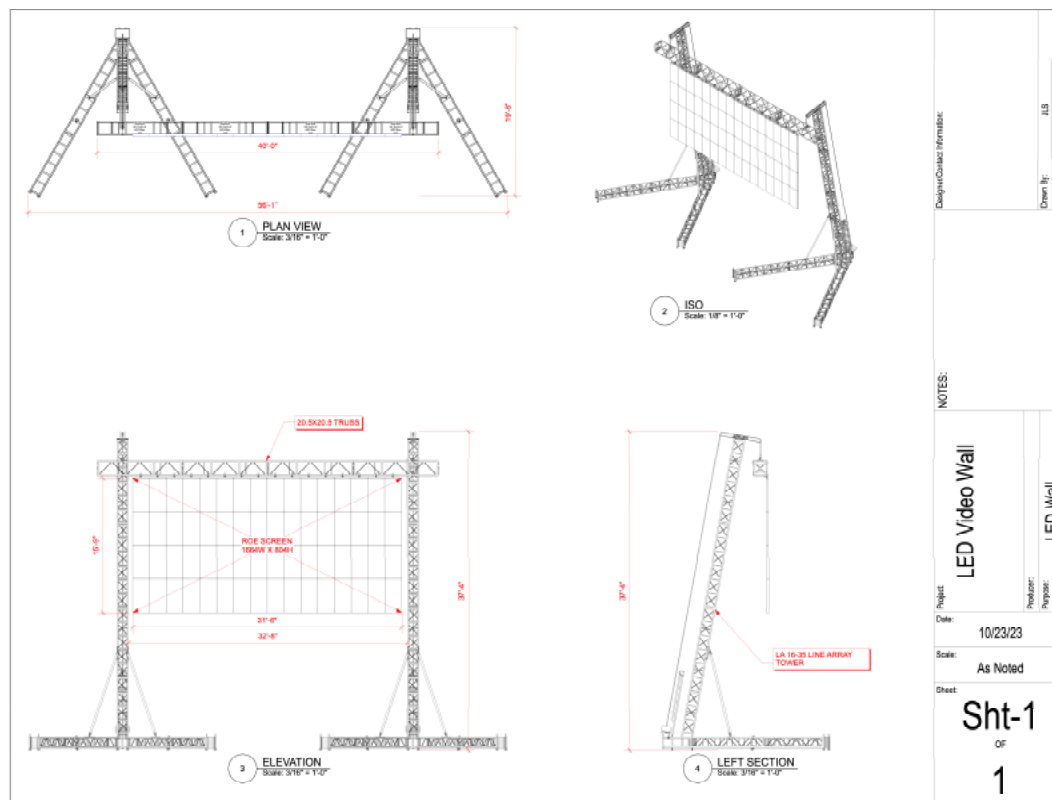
Four typical viewports showing different views: Plan, Isometric, Front Elevation, and Left Section of a LED Video wall.
